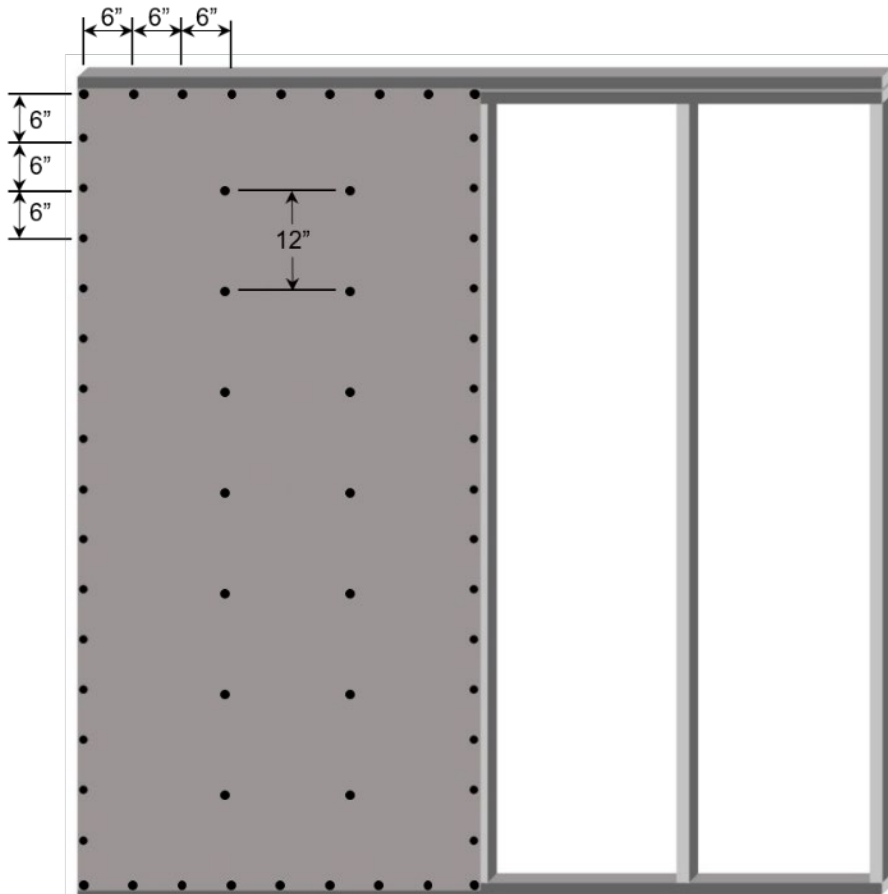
Nailing Pattern for Exterior Wall Sheathing
